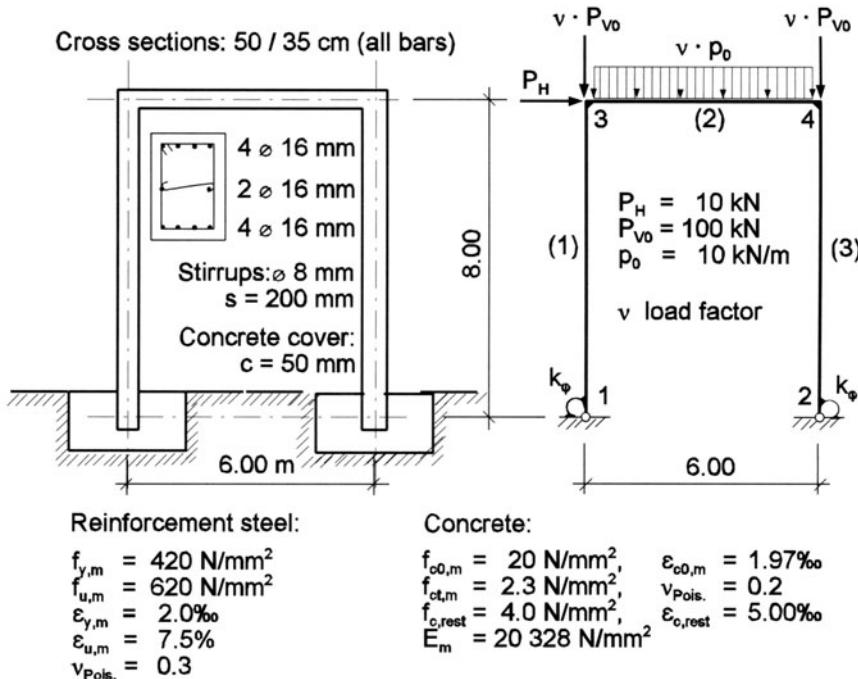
Reinforced-concrete frame (plane); structure, cross sections, materials, statical system with loading
